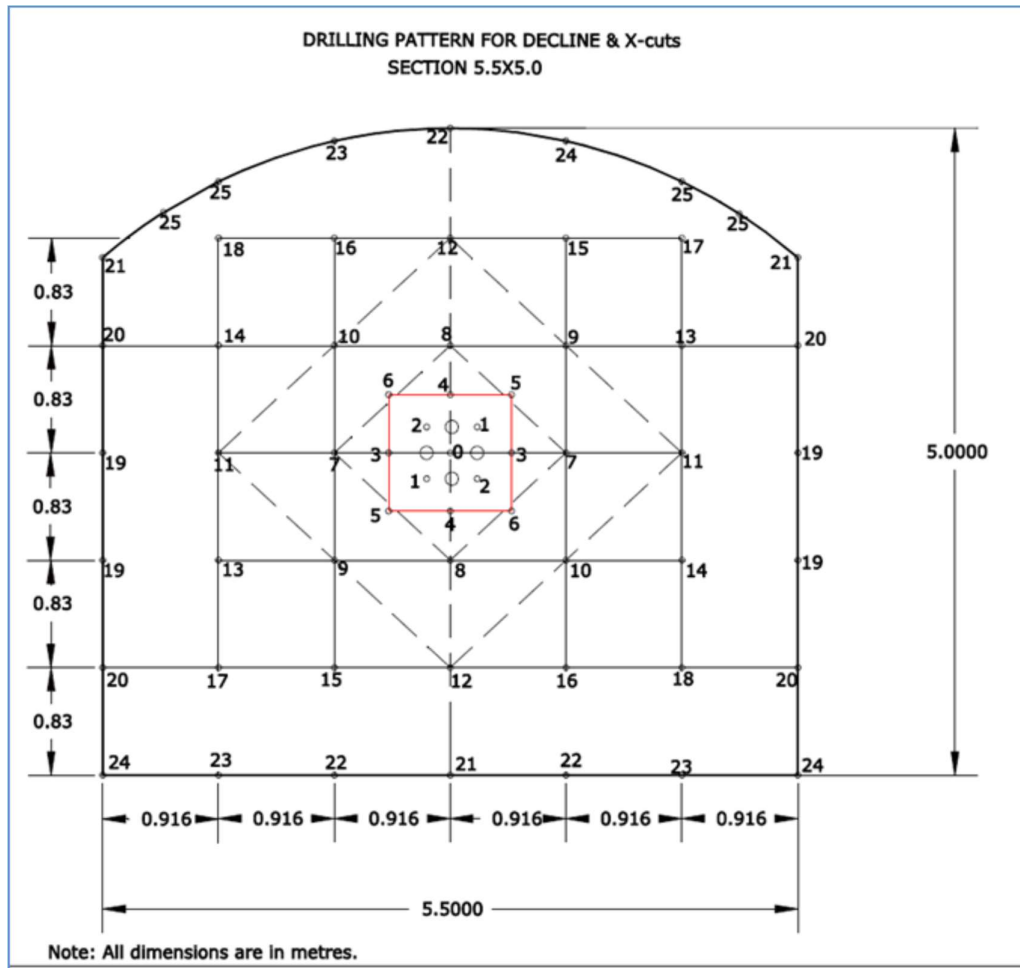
Burn Cut drilling and blasting Pattern for Decline Development
